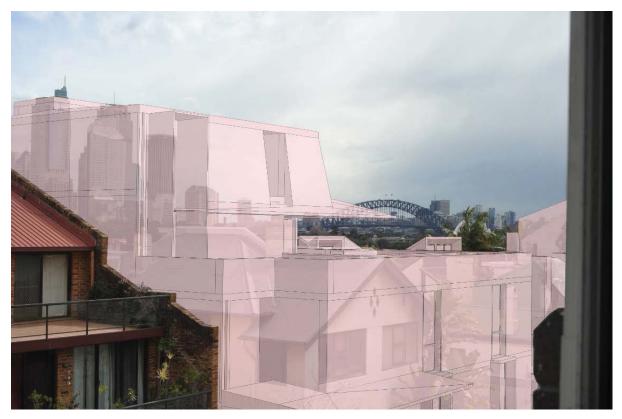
Sitting view from previous design at Unit 12 (120-130 Brougham Street)
